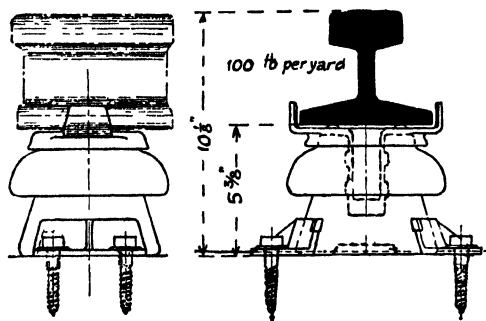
METHOD OF MOUNTING FLAT-BOTTOM CONDUCTOR RAILS
